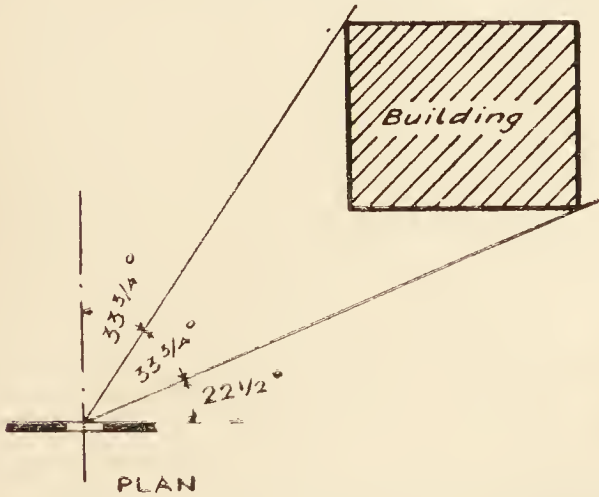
Block plan of building showing horizontal angle of light obstructed from window.
